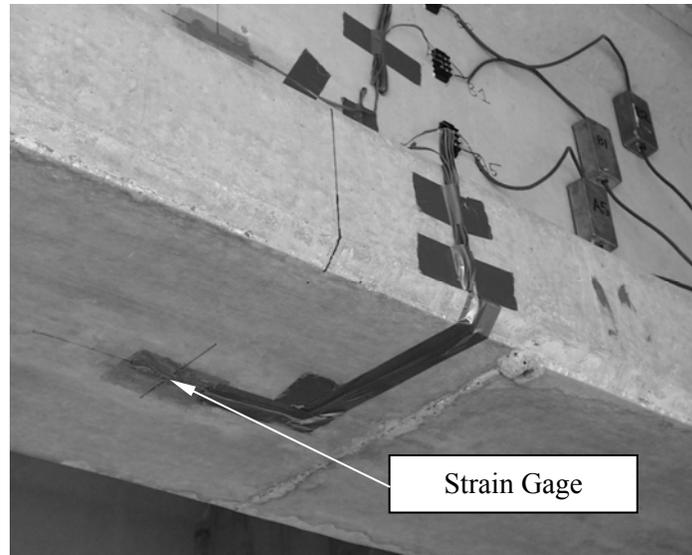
Strain Gage Attached to Bottom Flange of Prestressed Girder
